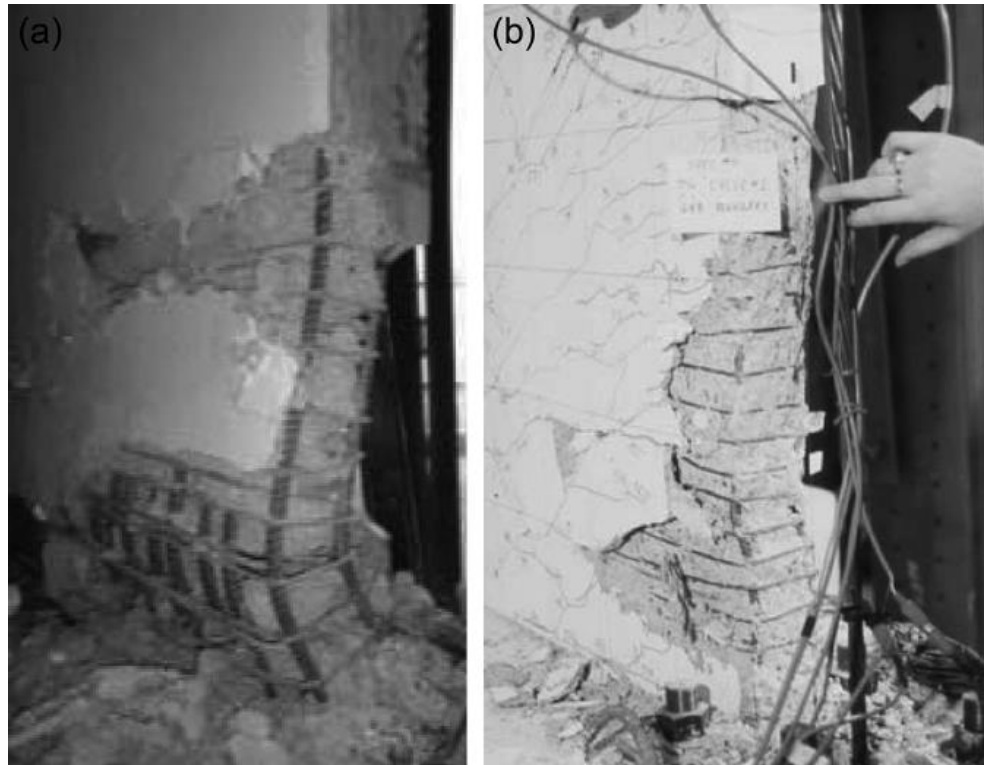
2010 Chile  $M_w$  8.8 Earthquake: Typical wall damage (after Wallace, 2012)
